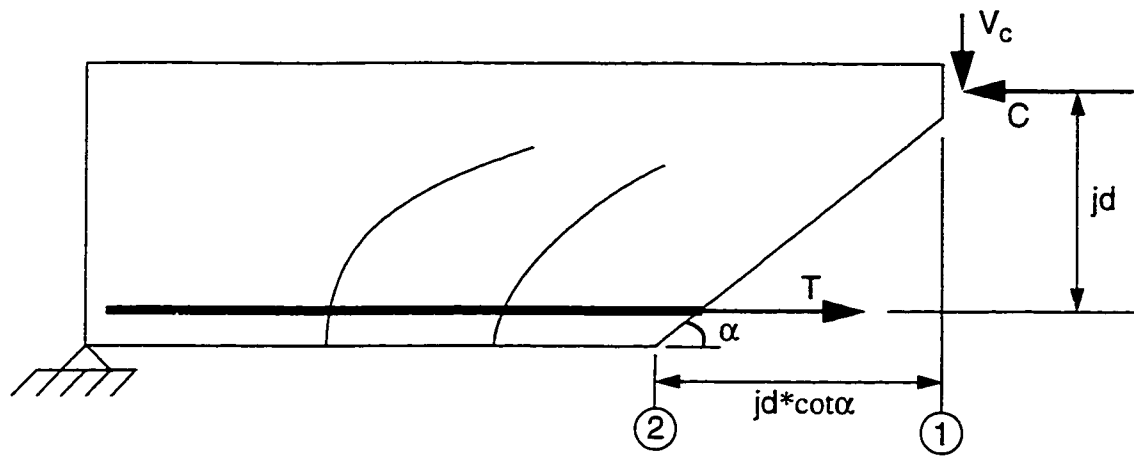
Shear Failure Mechanism in a Beam Without Web Reinforcement
